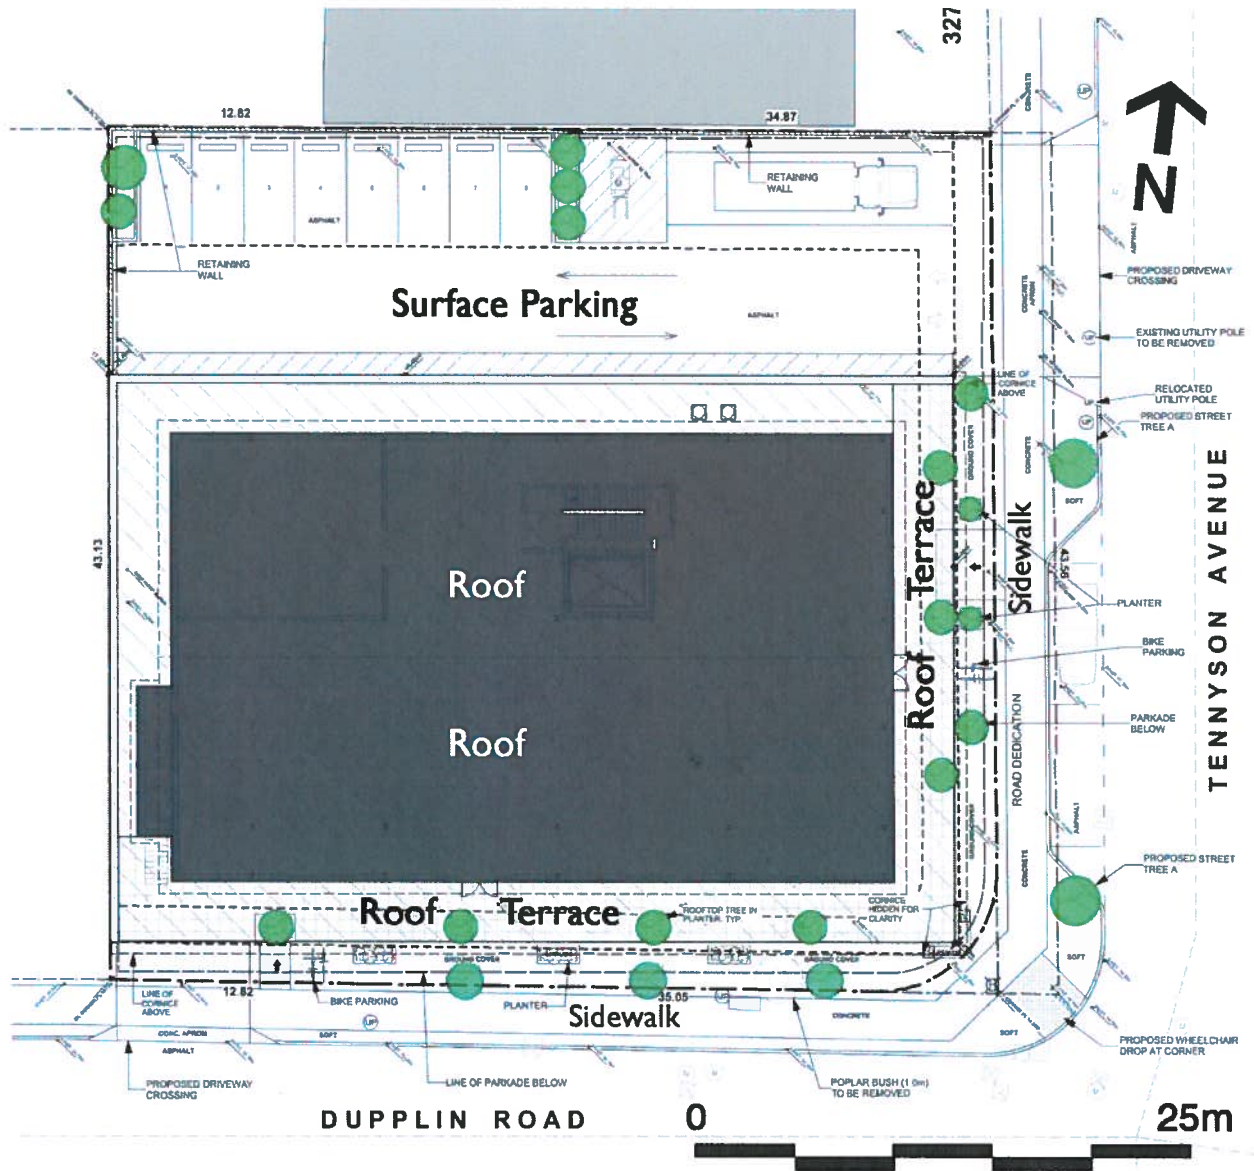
Site Plan and Roof Terrace (from plans by Boni Maddison Architects)
